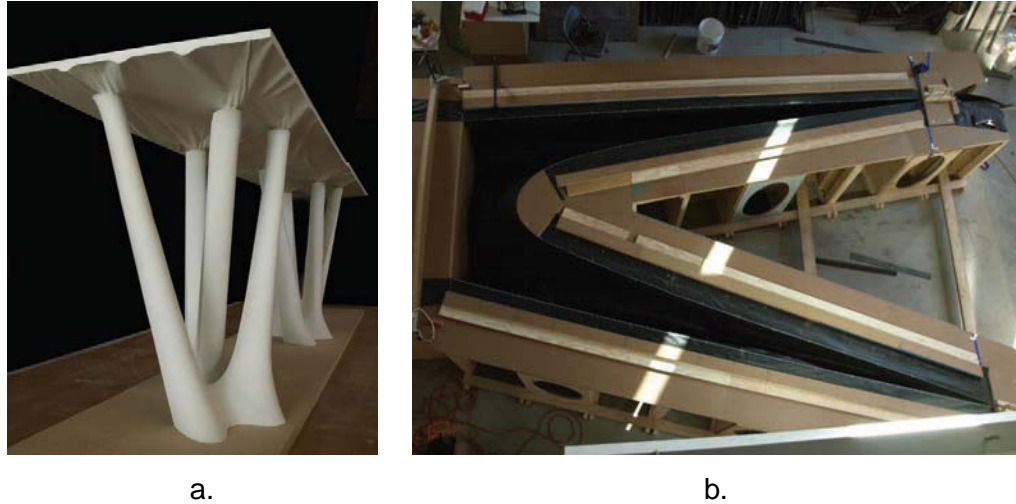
‘Key-hole’ beam construction (Garbett, 2008)
